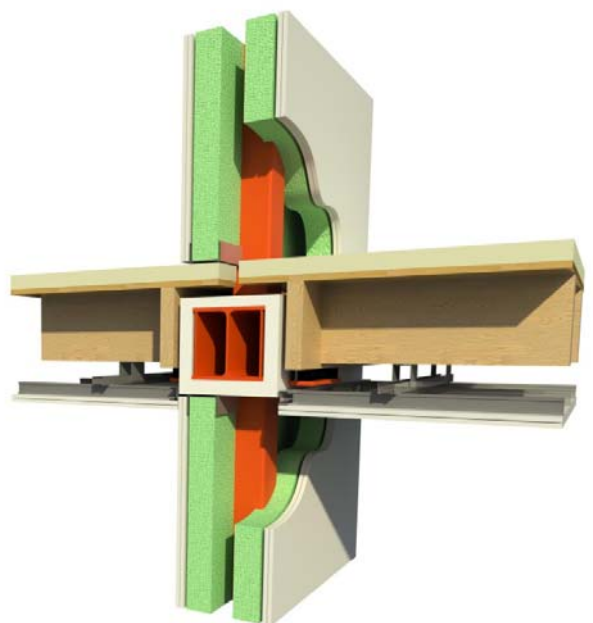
Detail of separated floors and walls (Source: Royal HaskoningDHV)
